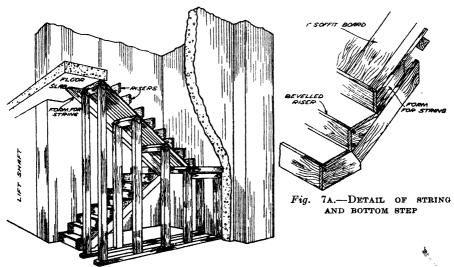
FORMWORK FOR CONCRETE STAIR AT D IN FIG. 1
